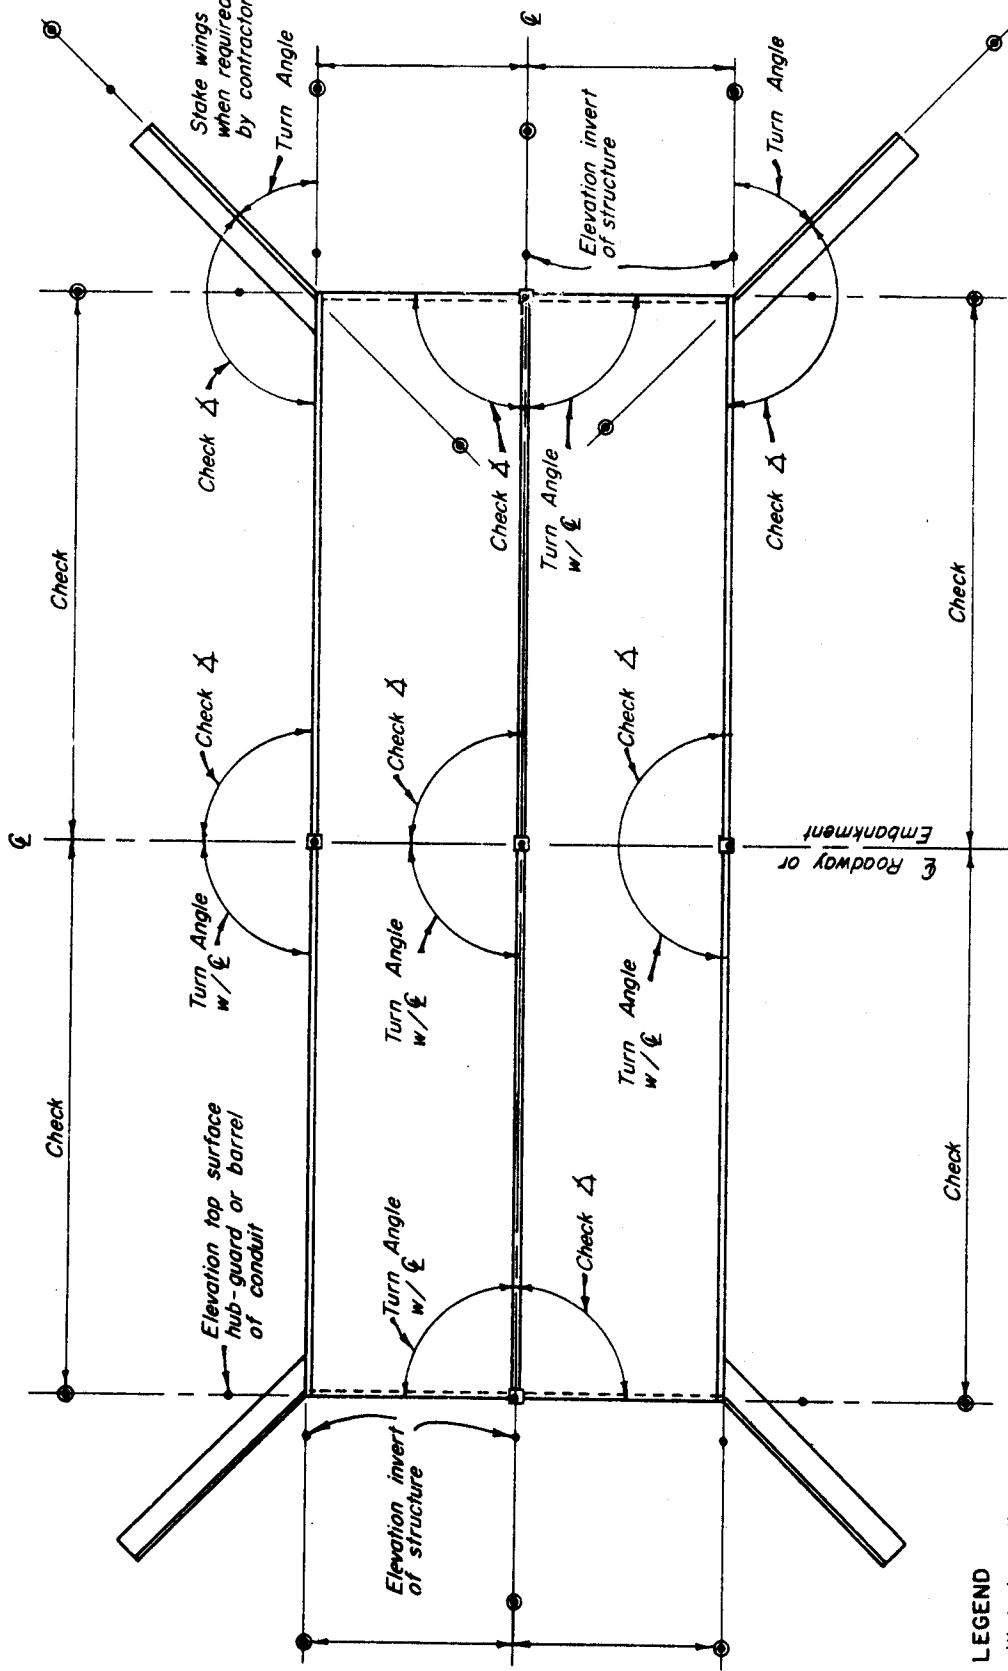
EXAMPLE FOR STAKING MULTIPLE BOX CONDUITS
